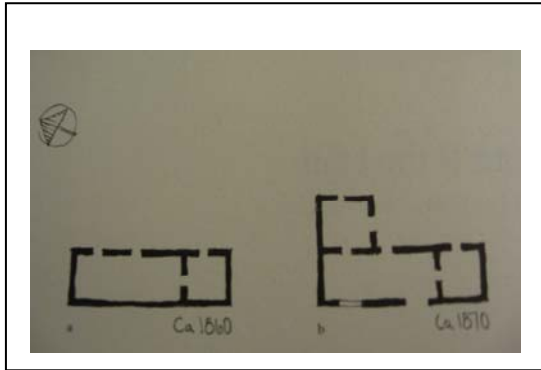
IMAGE B: New Mexican Building Plans of 1860 & 1870⁵⁴
